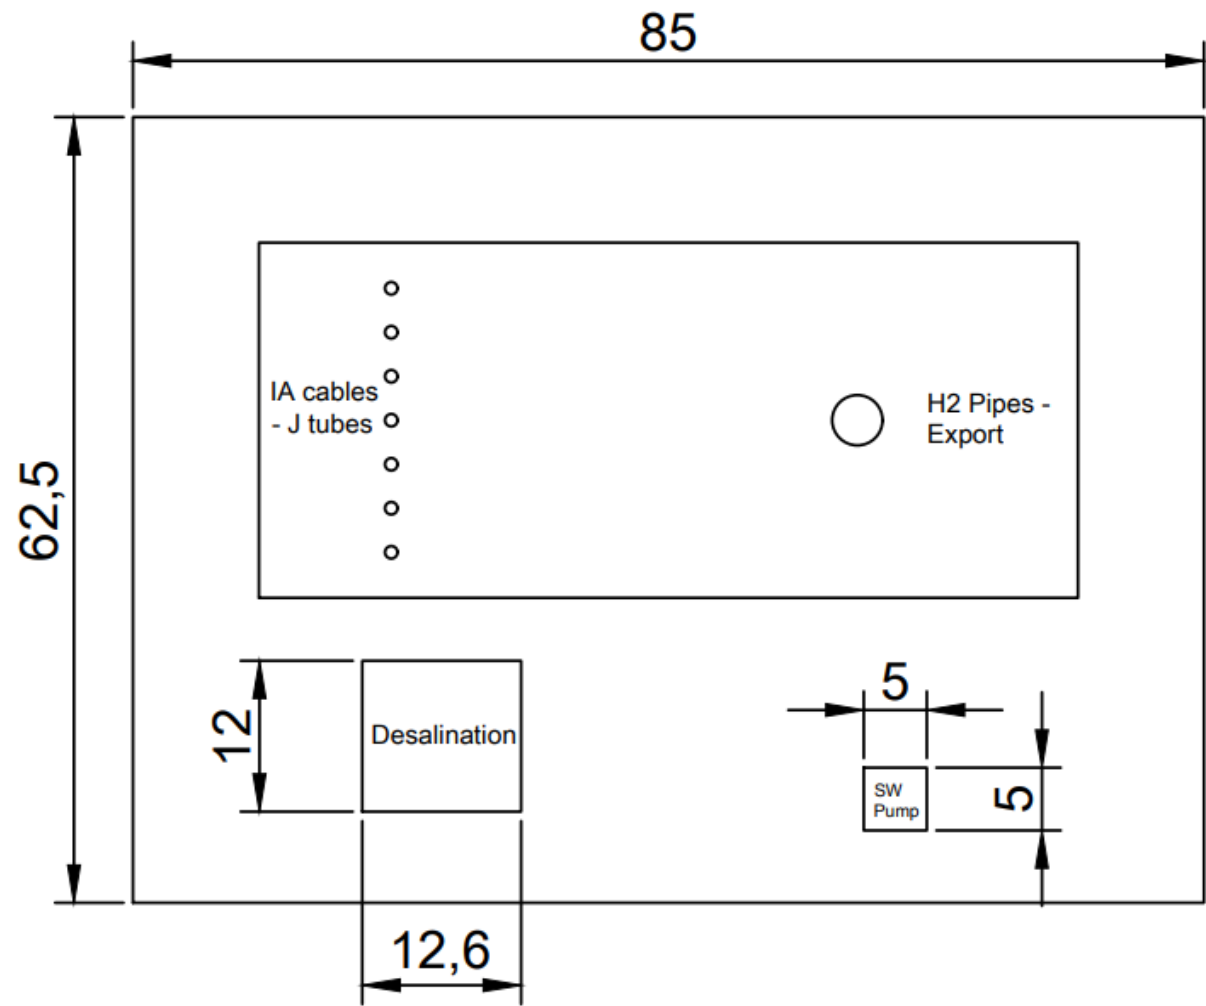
Deck #1 2D Layout at 23 meters (Cable Deck)
